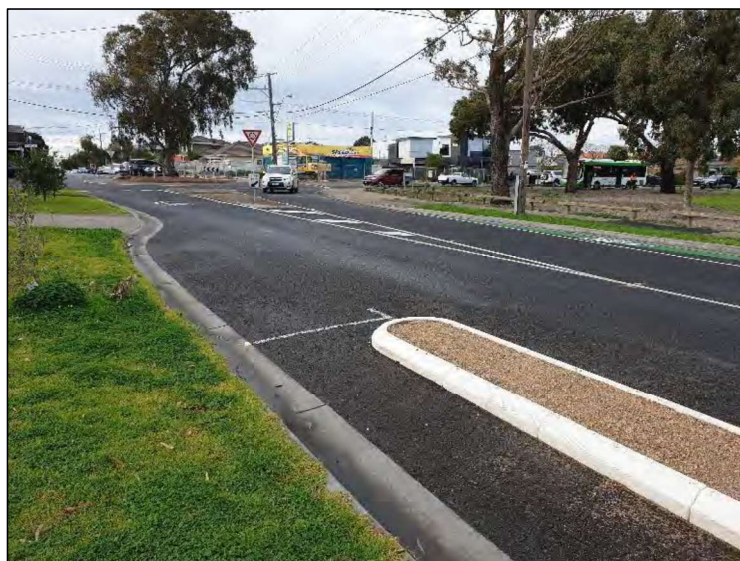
Kent Road approaching Cumberland Road roundabout – facing east
